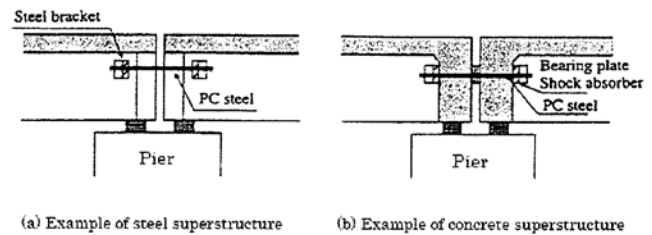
Examples of Unseating Prevention Structures Connecting the (2 spans) superstructure mutually
